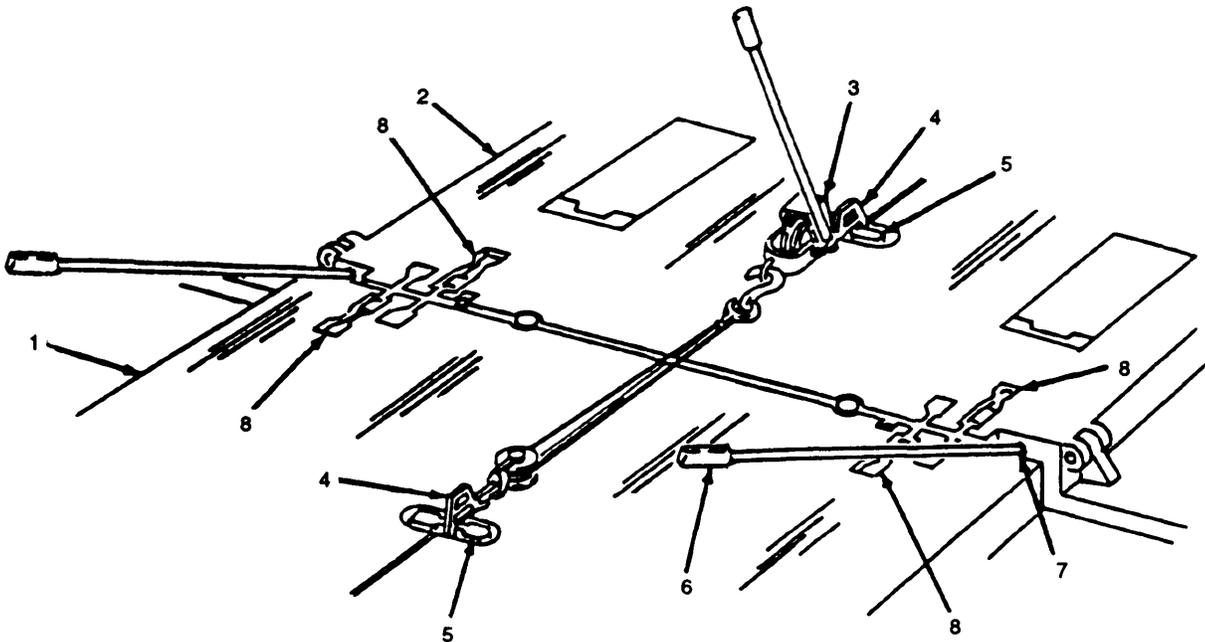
Ramp Bay To Interior Bay Connection (Sheet 1 of 2).
